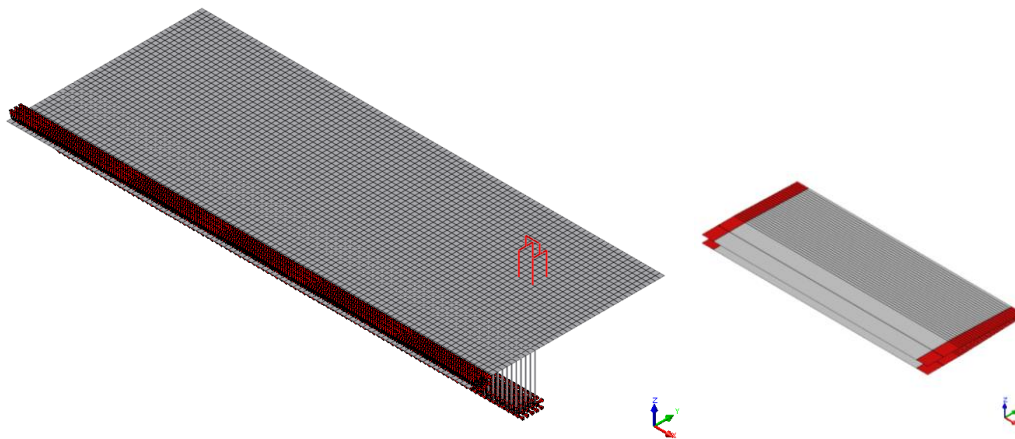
FE-model of slab DR2-C used in the experiment and the reinforcement model.
